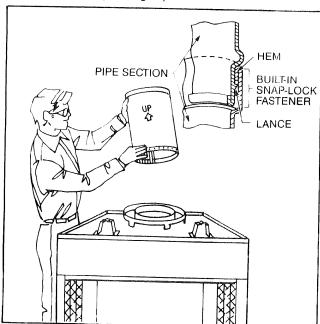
Use built-in snap-lock fasteners to attach chimney pipe sections.
